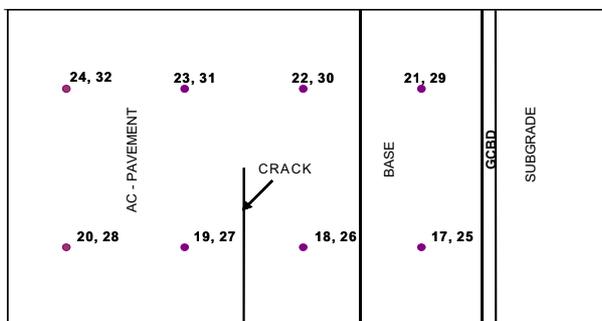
Plan view of test box. The numbers label the tensiometers that are located 25 mm below the base/ subgrade interface (17-24) and 13 mm above the interface (25-32). The box tilts down and to the right.
